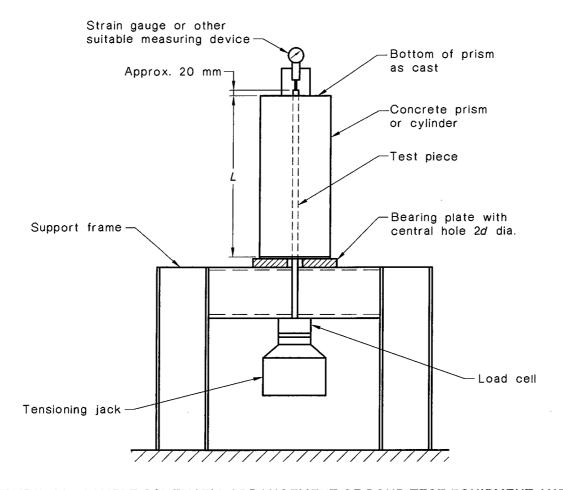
SAMPLE SCHEMATIC ARRANGEMENT OF BOND TEST EQUIPMENT AND TEST SPECIMEN
